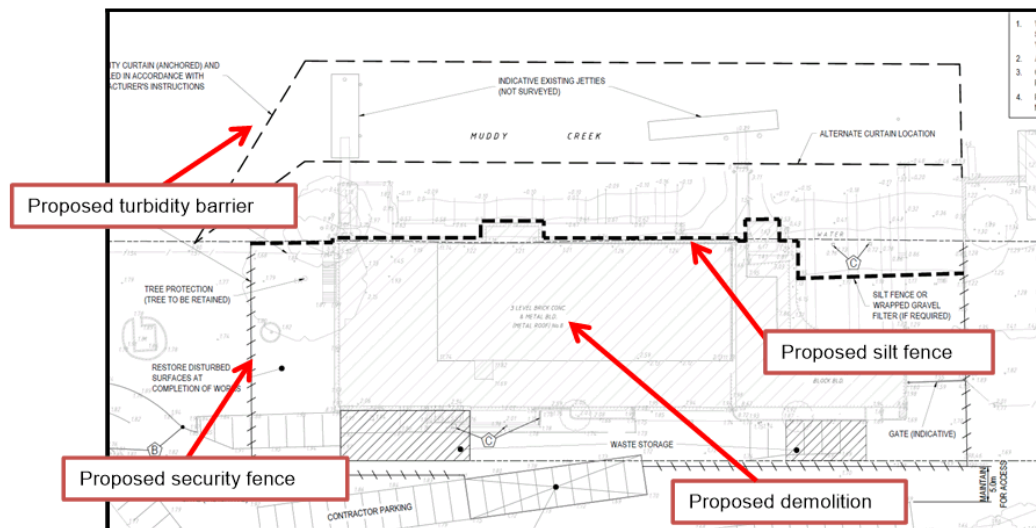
Proposed Demolition and Sediment Control Plan (Source: Cardno, July 2019)
